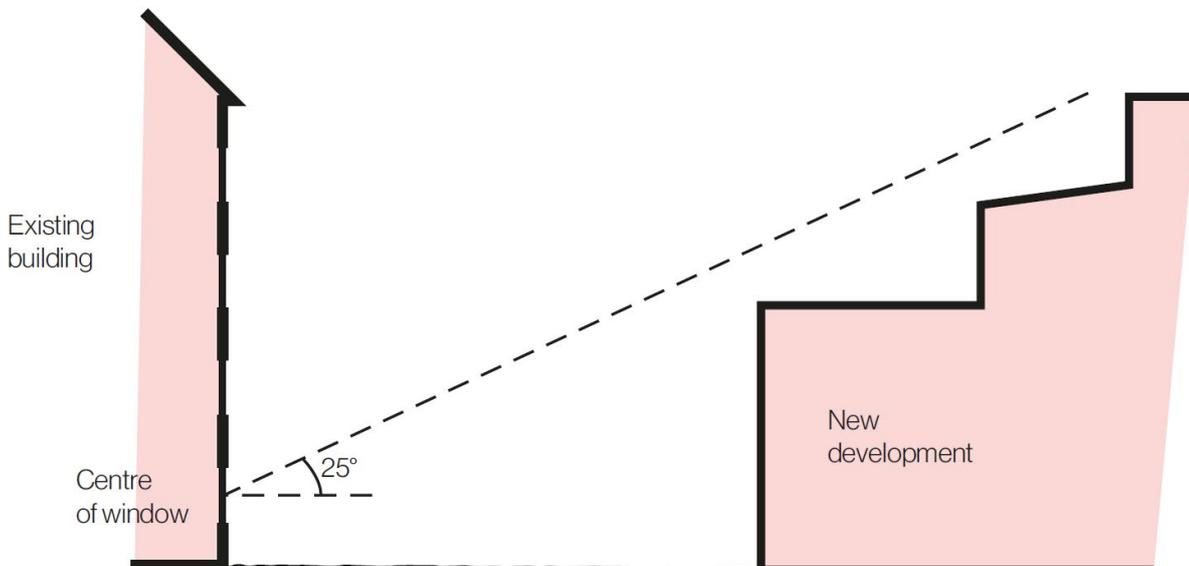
BRE VSC diagram (Figure 14): Section in plane perpendicular to the affected window wall
